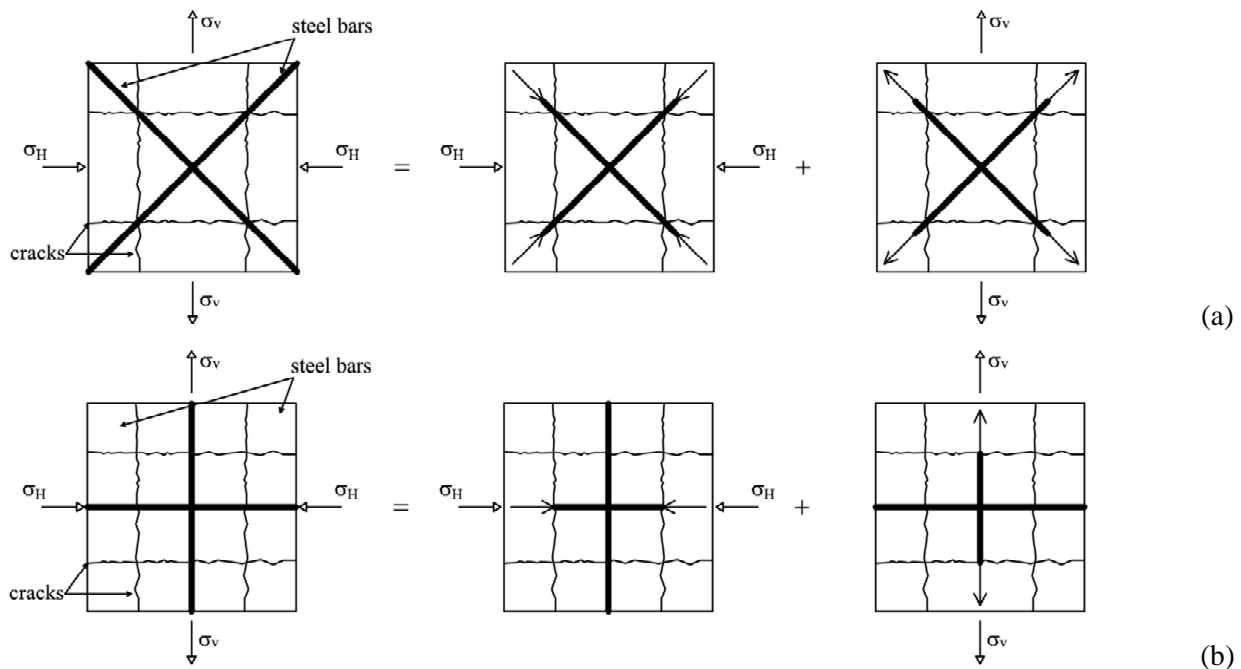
Cracked RC element, effect of steel bar orientation on the pinching mechanism: (a) CA3 panel with 45° steel bar orientation and (b) CE3 panel with 0° steel bar orientation.
